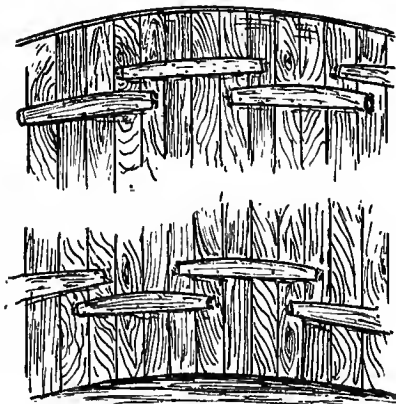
Use of barrel staves in setting up a stave silo; they should be removed before the silo is filled.
